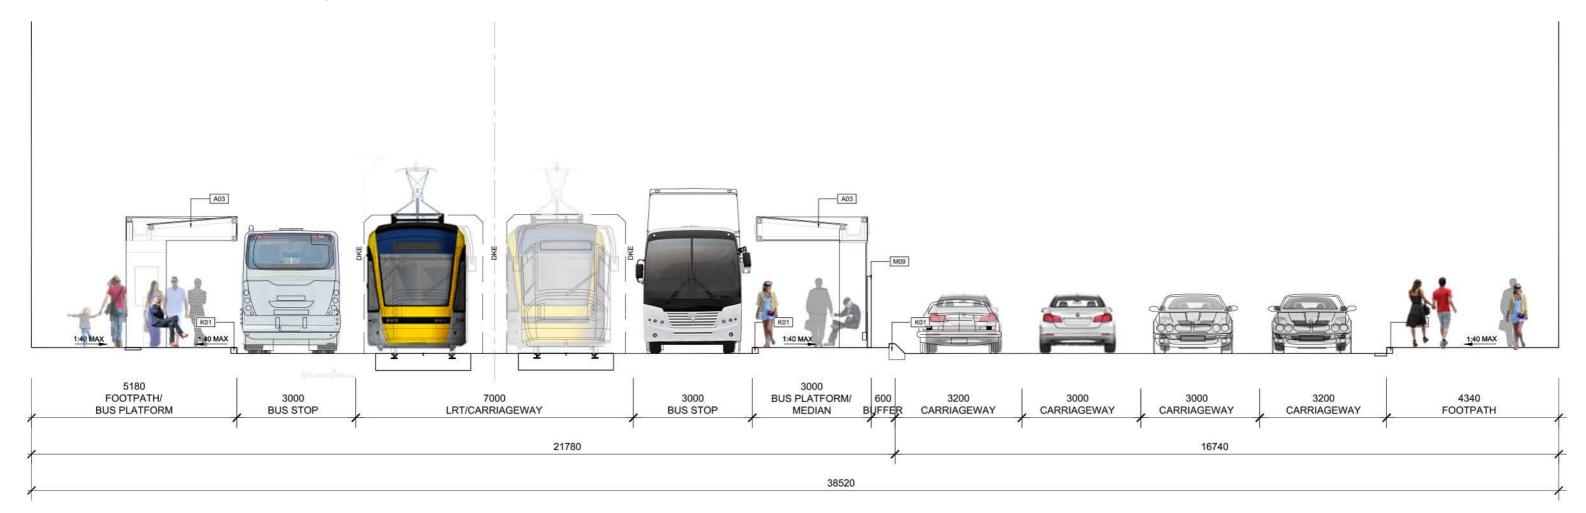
Partial plan and section of Fanshawe Street between Daldy Street and Halsey Street looking east
